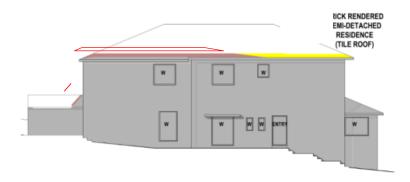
Proposed shadow impacts to No. 59 Reina Street at 9am on 21 June (additional shadowing outlined in red, sunlight shown in yellow)
